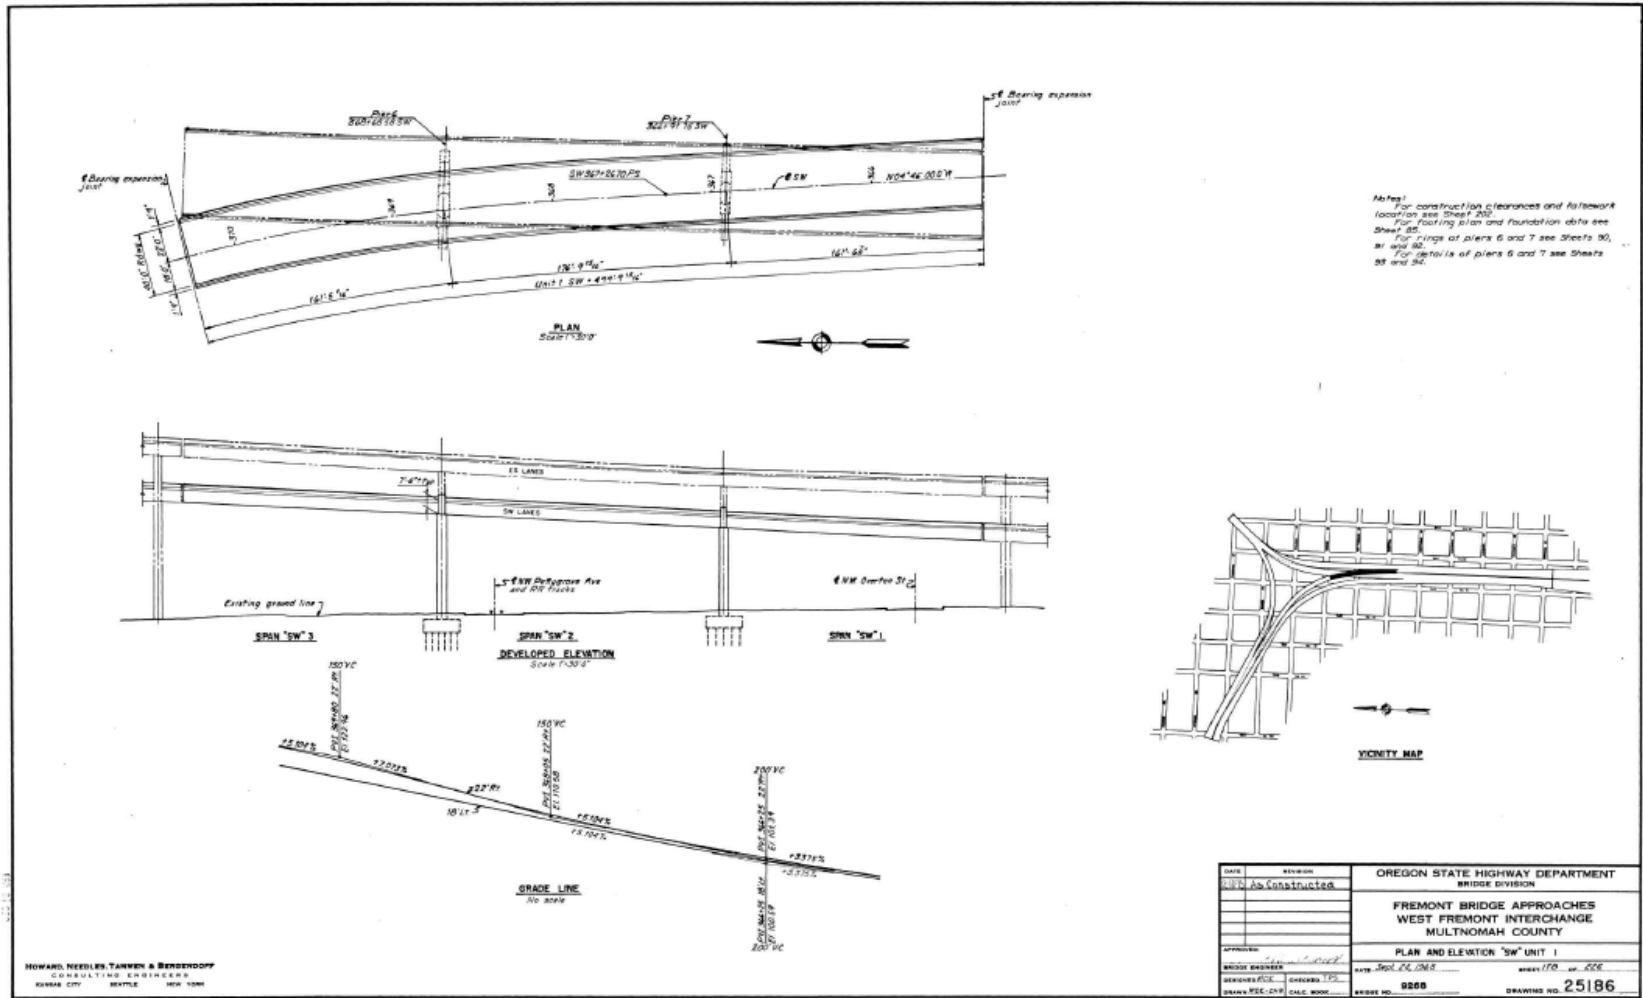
Plan and elevation views of SW Unit 1 Bridge superstructure 09268A.
